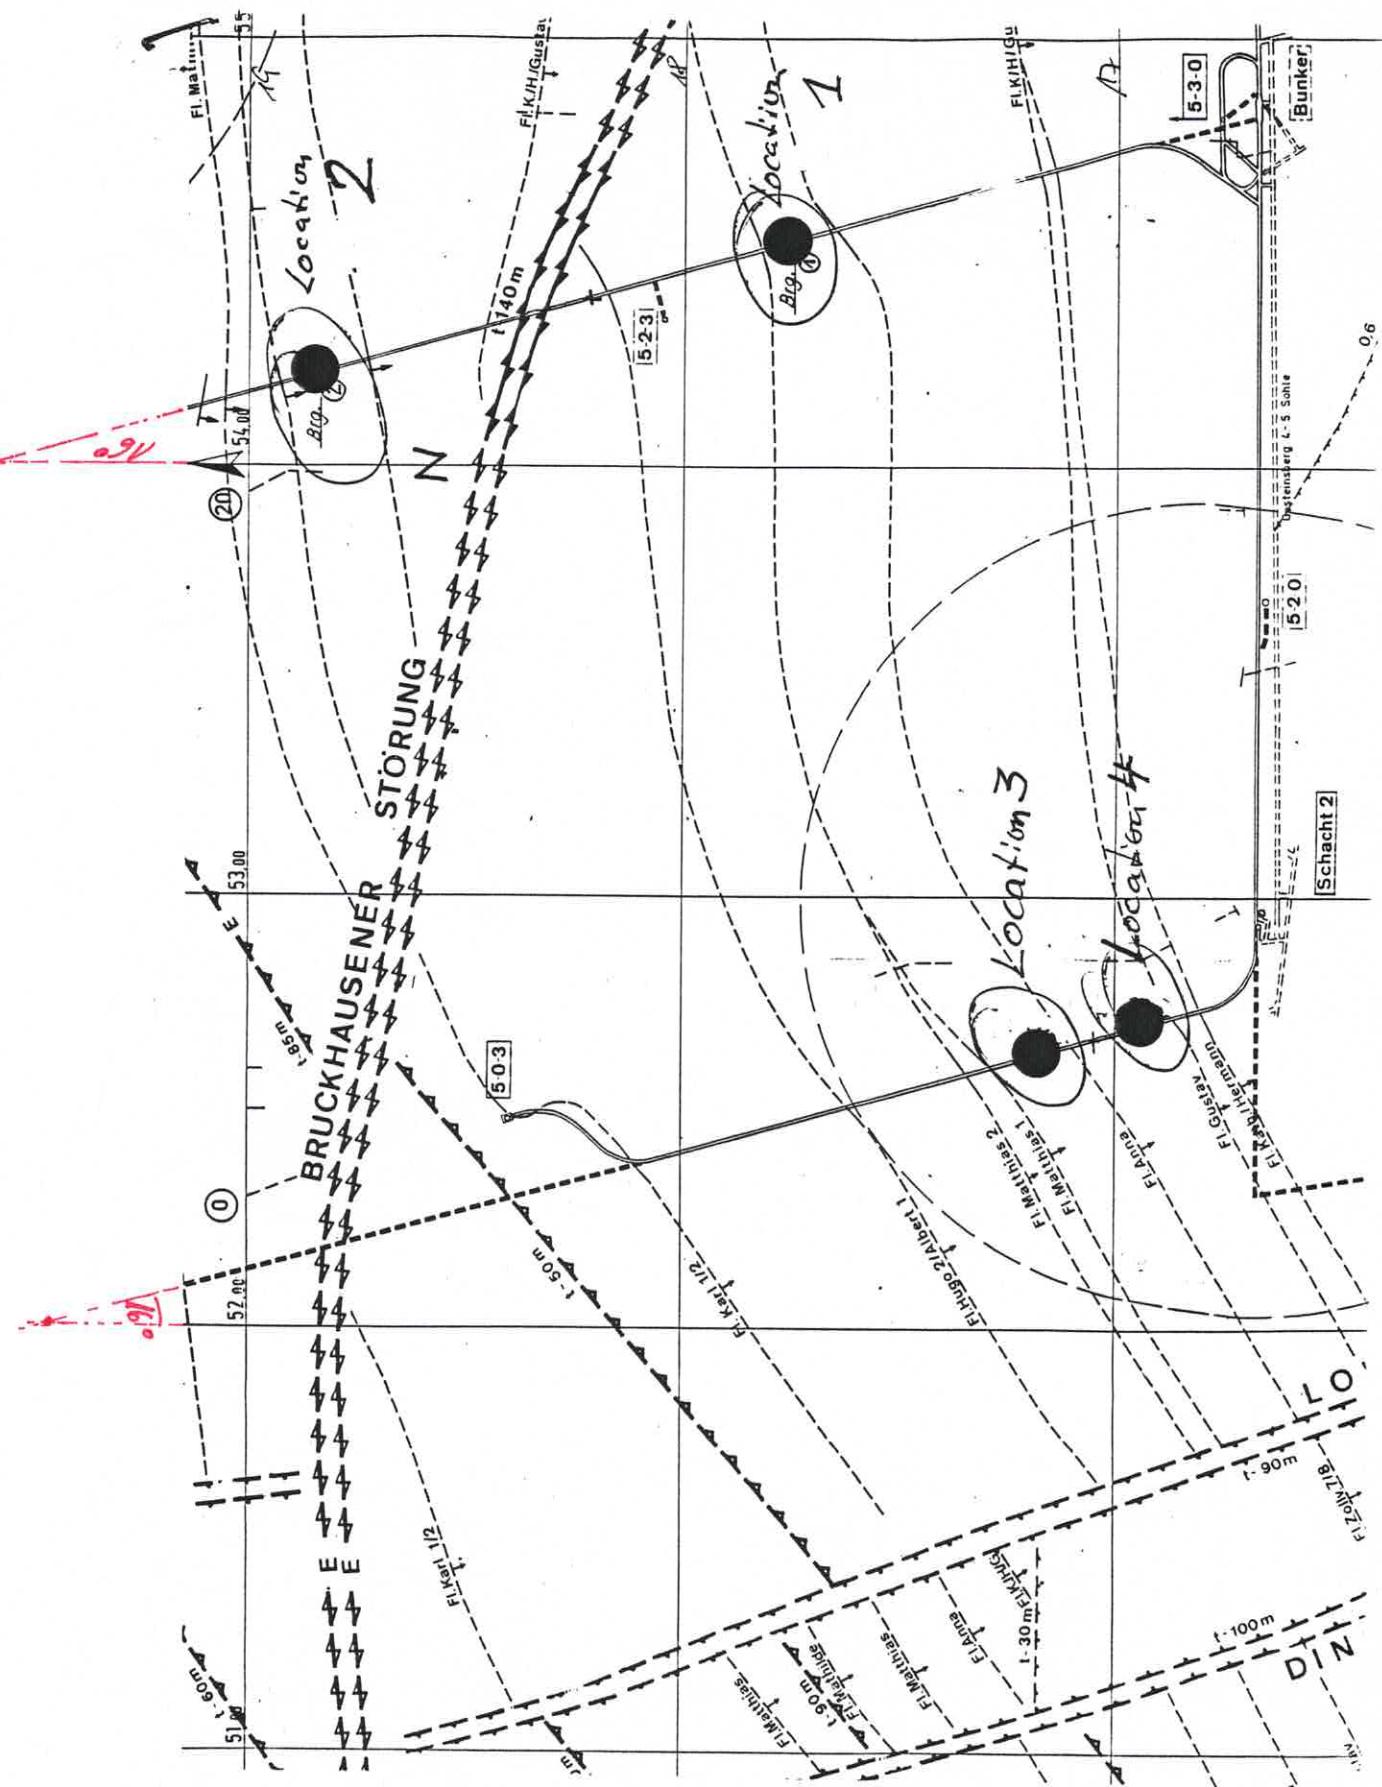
Test location at Mine General Blumenthal (horizontal cross section)
